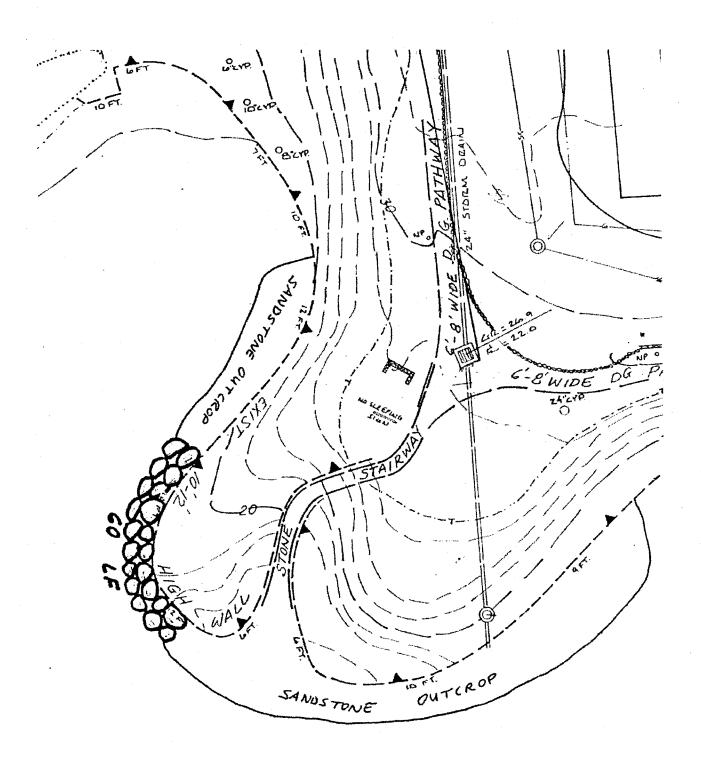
Drawing of proposed Site #2 revetment installed in sandstone gap.
